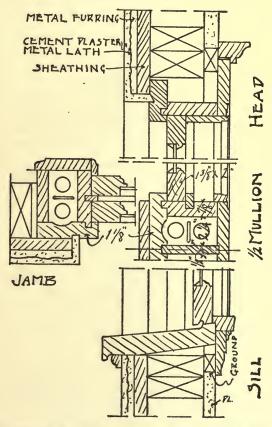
Double-Hung Window, Outside of Building Plastered.
